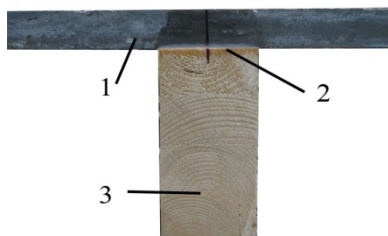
Cross-section: 1 – UHPC slab, 2 – glued connection, 3 – glued laminated timber beam
